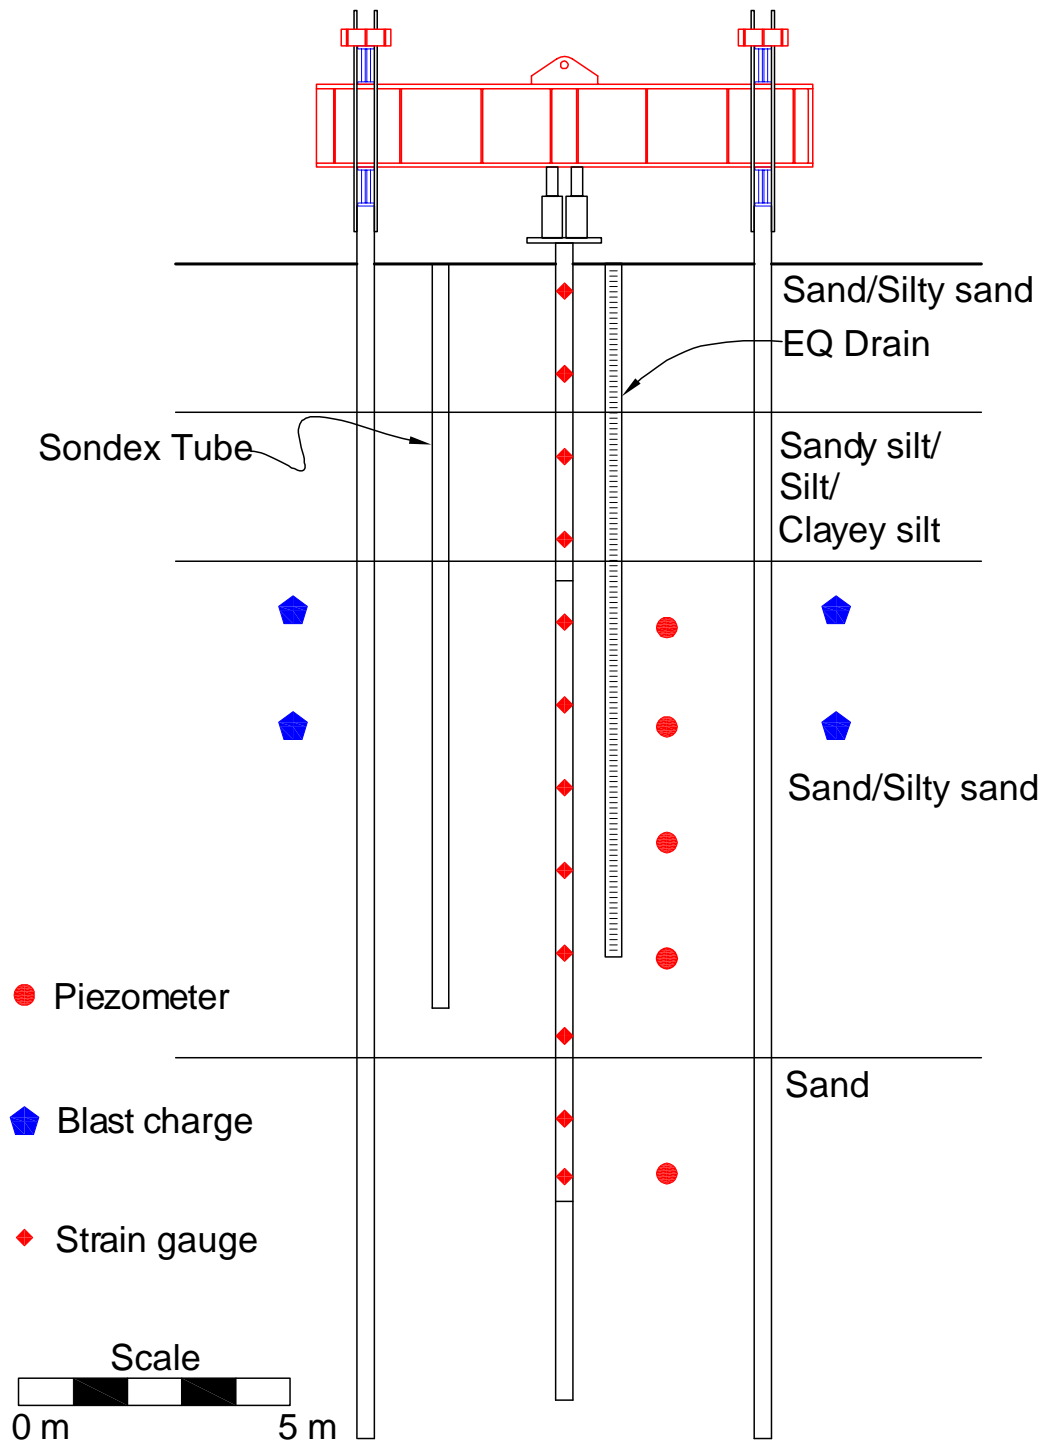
Profile view of pile foundation and instrumentation layout at Site 3.
